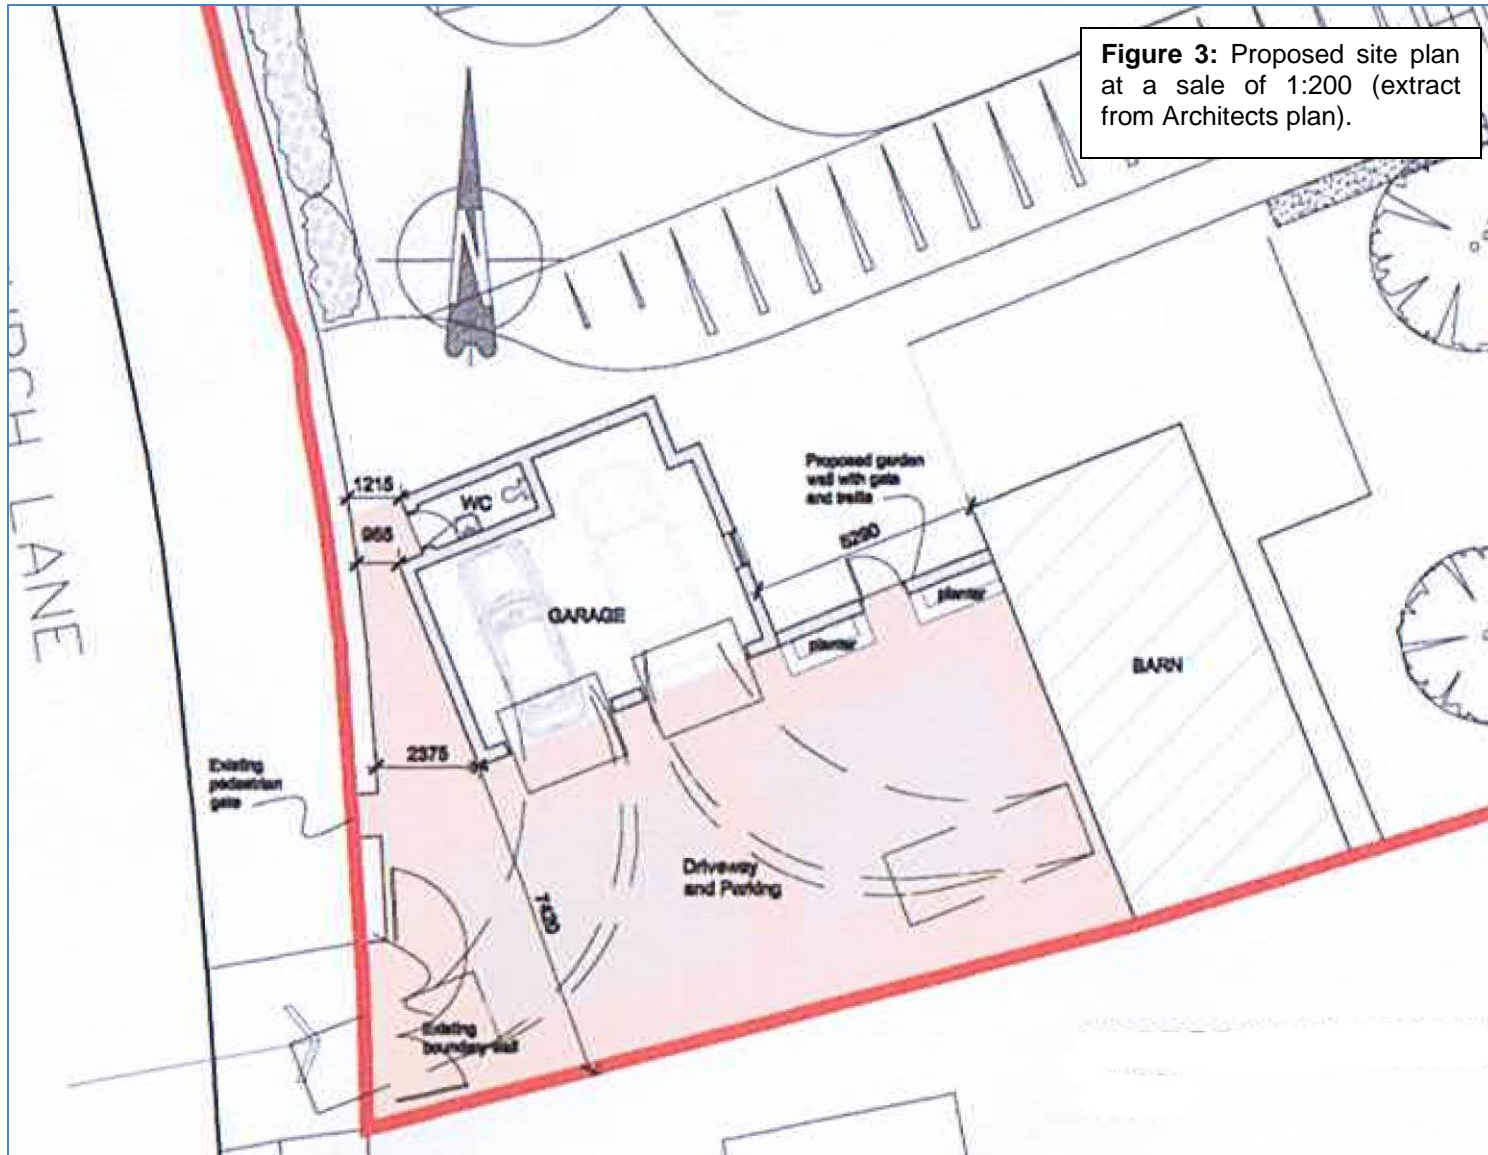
Proposed site plan at a scale of 1:200 (extract from Architects plan).
